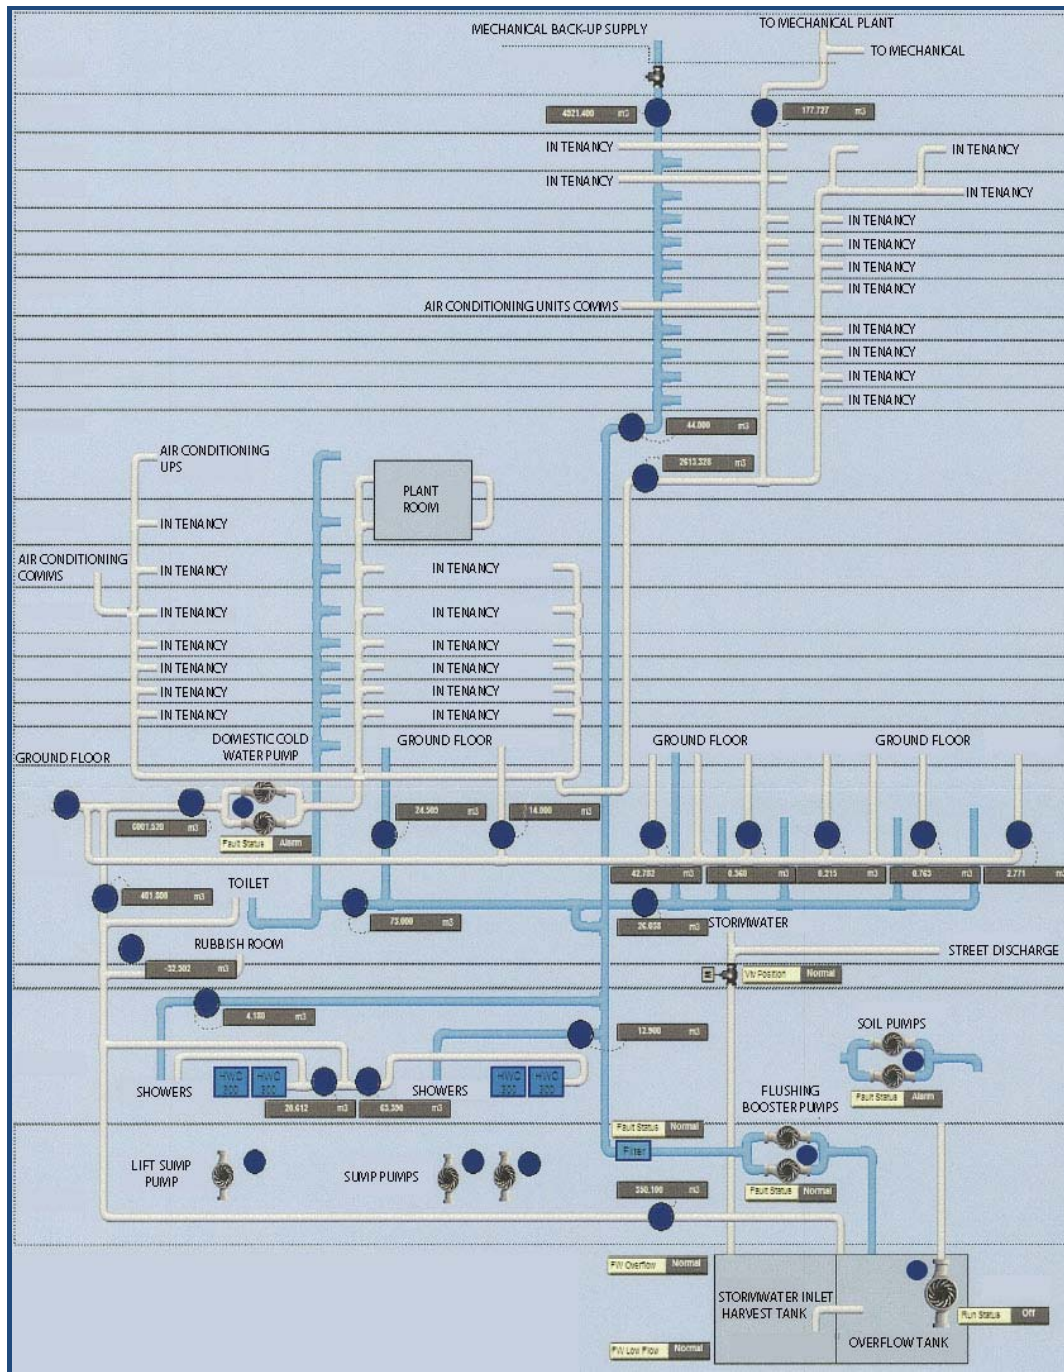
A studied GSNZ Buildings' Water Reticulation Plan
